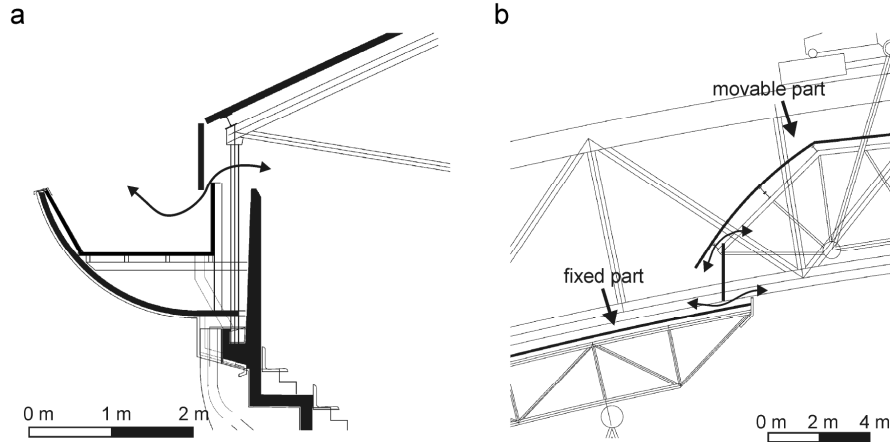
(a) Ventilation opening between the stand and the roof construction. (b) Ventilation opening between the fixed and the movable part of the roof.
